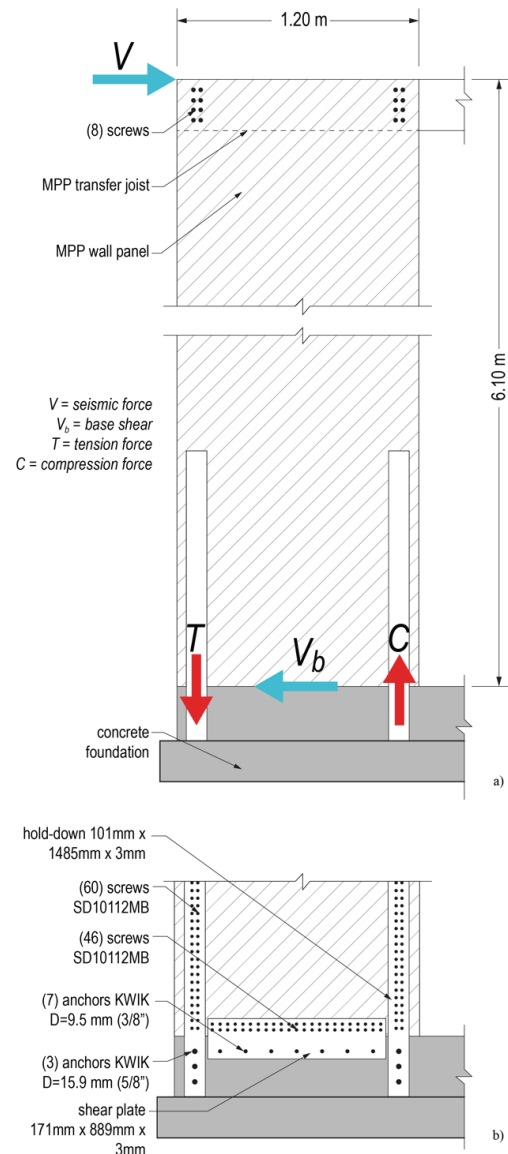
a) Panel dimensions and reaction forces for connection design, b) foundation connection design
